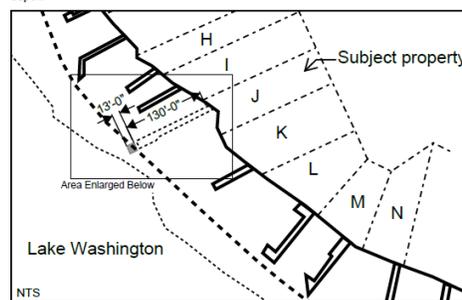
B - How to determine the maximum length a pier may extend beyond existing nearby piers (KZC 83.270.4).
